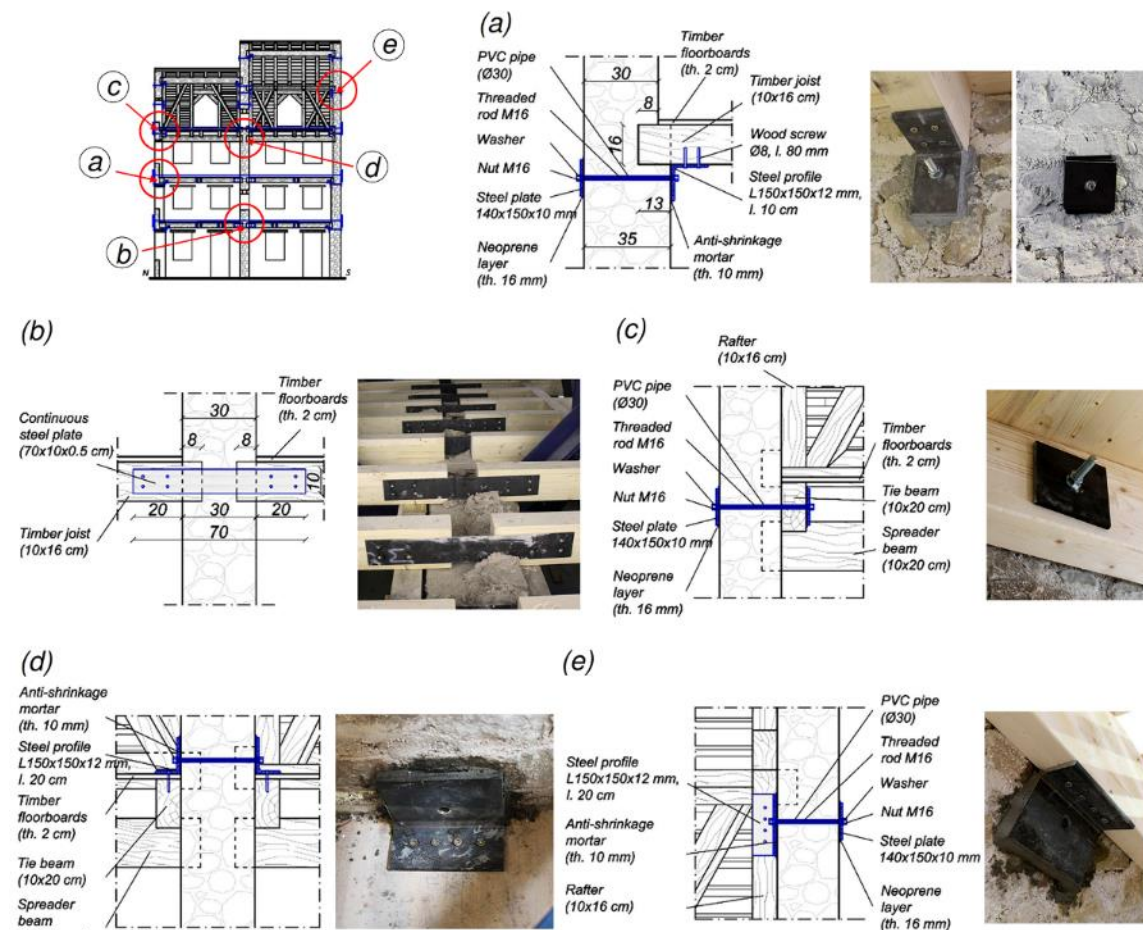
Wall-to-diaphragm connections (vertical sections and photos): (a) North and South walls to first- and second-floor joists or ridge beam; (b) transverse party wall to first- and second-floor joists; (c) North and South walls to roof-truss tie beam; (d) transverse party wall to roof-truss tie beam; (e) gables to roof-truss rafter. Units of cm, unless otherwise noted.
